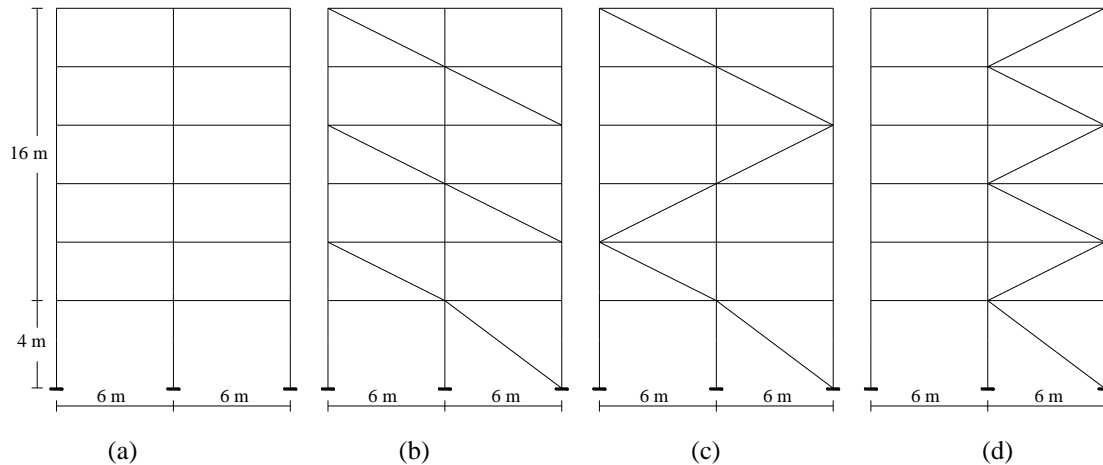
Elevation view of a) unbraced frame (Tirca *et al.* 2003) and braced frames: b) conf-1, c) conf-2, and d) conf-3 under investigation
